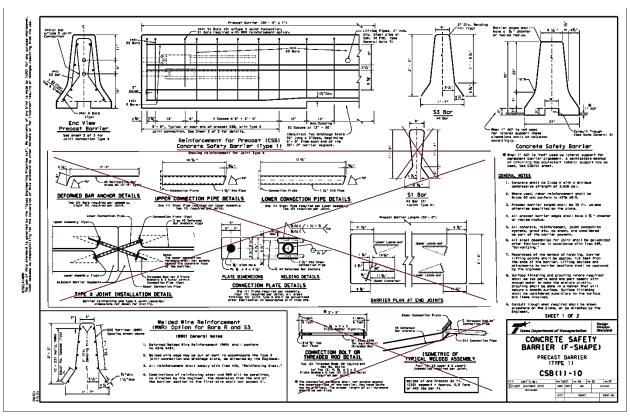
Detailed Drawing for Barriers Used during Testing.
